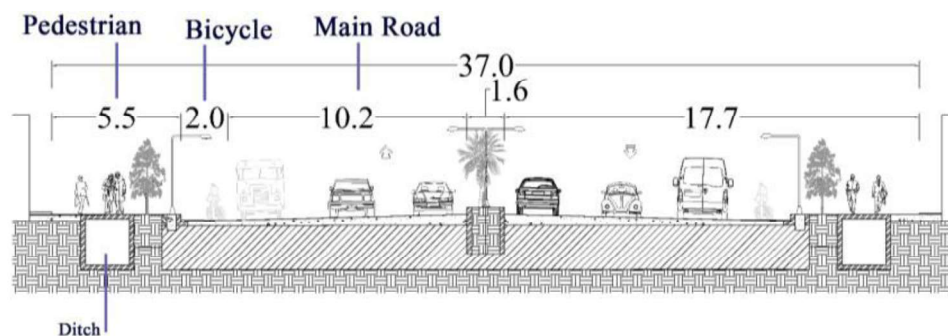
Proposed main street detail section; Source: (Researcher Own design, 2022)
